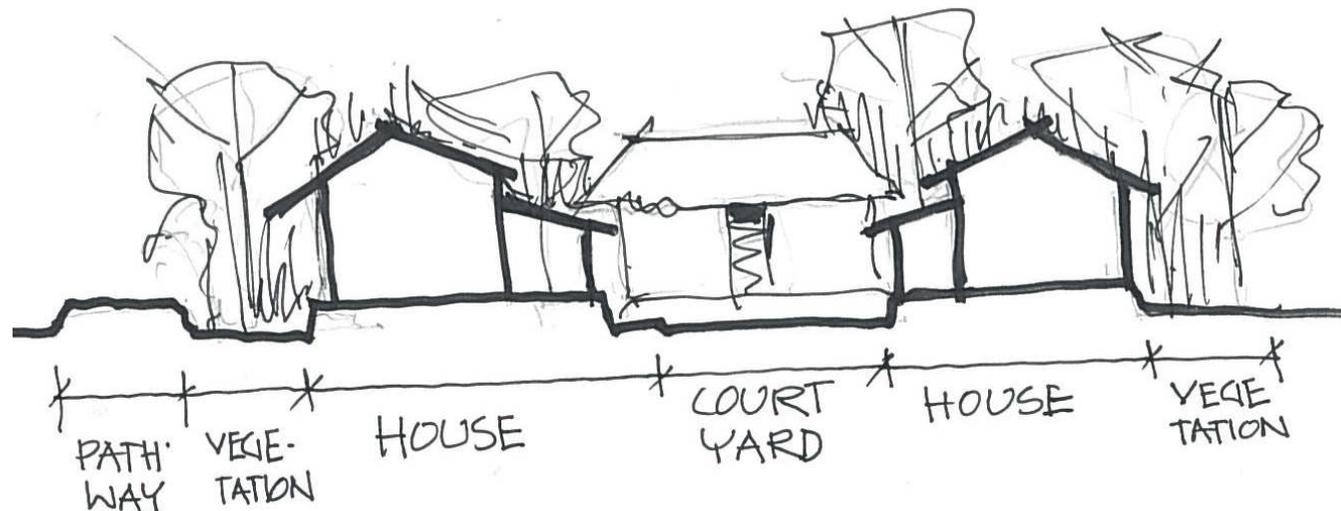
SECTION OF A TYPICAL CLUSTER OF HOUSES
